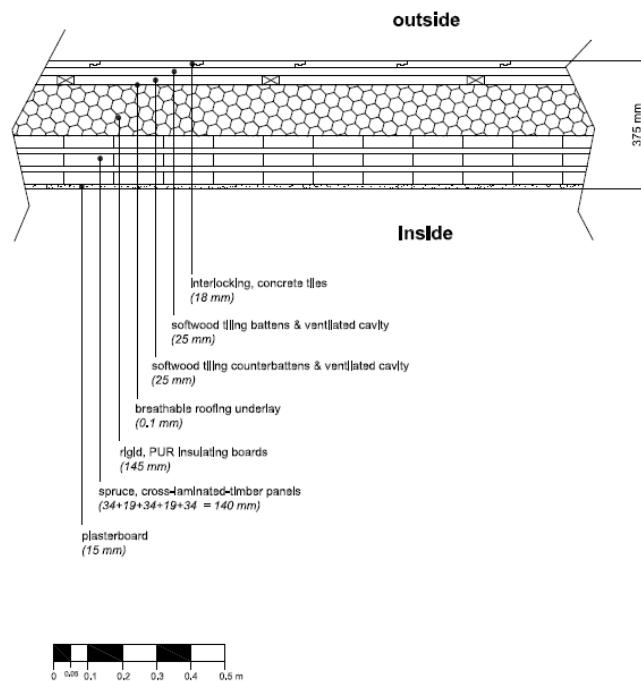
Roof D (cross-laminated timber (CLT)), cross-section.
